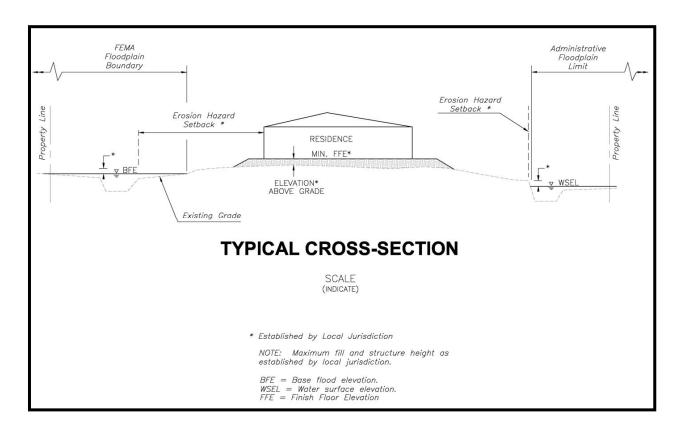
Arizona requirement to provide positive drainage away from new buildings outside the SFHA.
